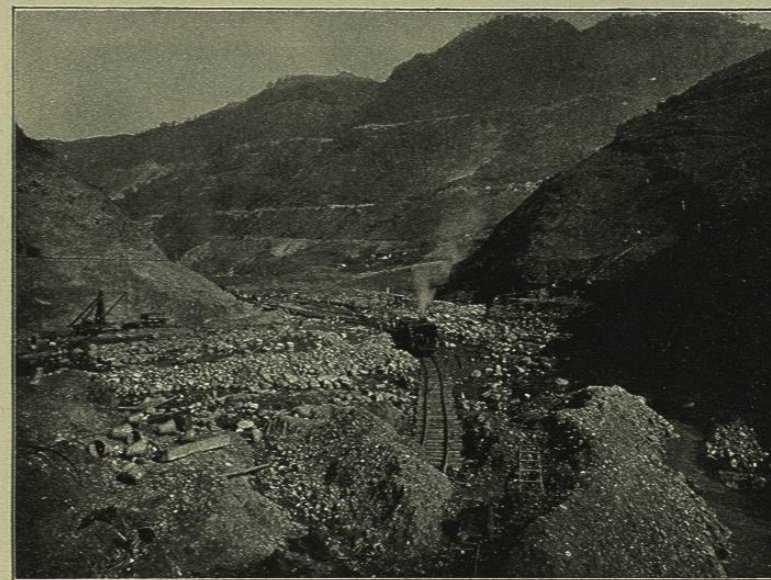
LOOKING UP STREAM AT SITE OF DAM NO. 2, AT NECAXA, SHOWING STRIPPED ABUTMENTS FOR THE DAM ON EACH SIDE.
